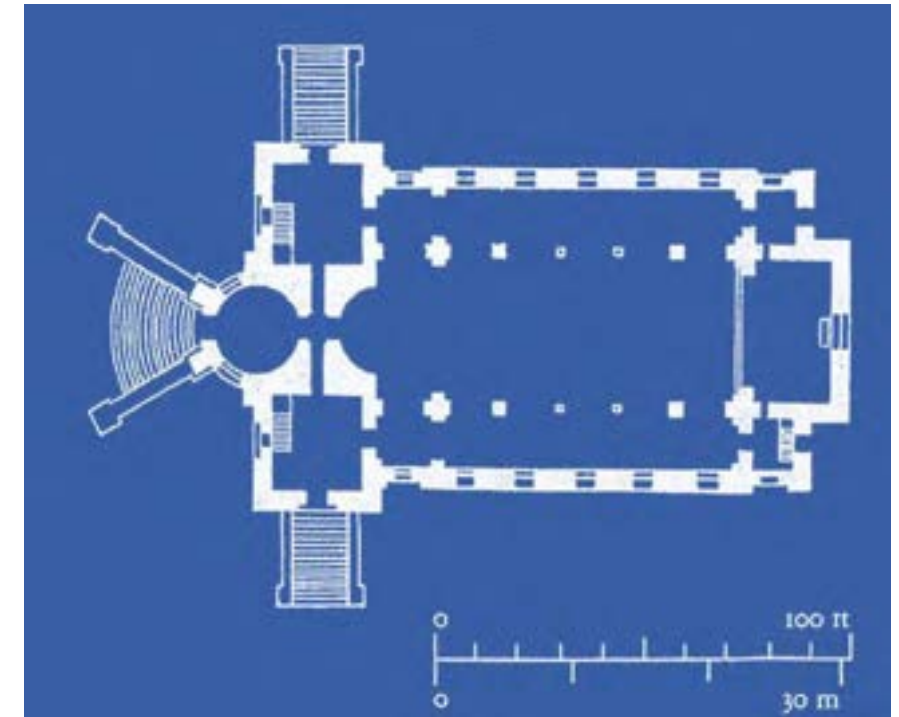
Plan of St Anne's Lime House, London. Hawksmoor constructs a dramatic special sequence, a flight of steps, a circular vestibule, and a narrow passage before the full interior of the church is revealed.
